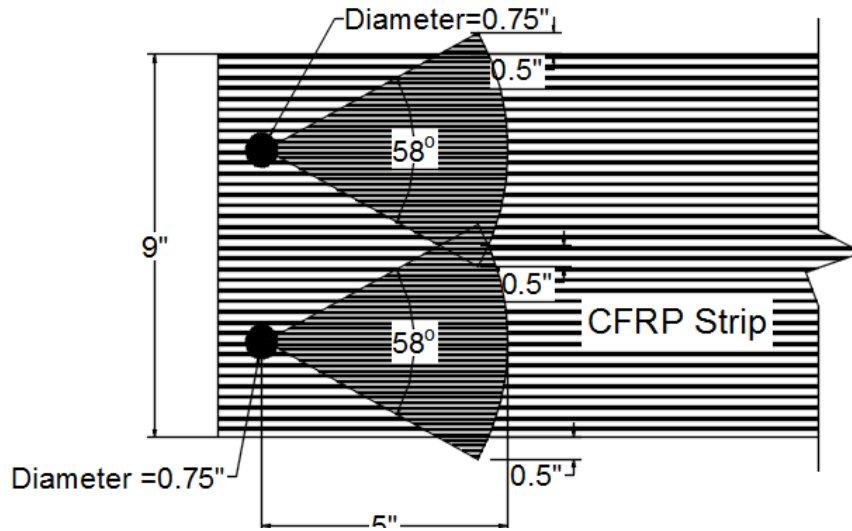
Layout of CFRP strip with two CFRP anchors
